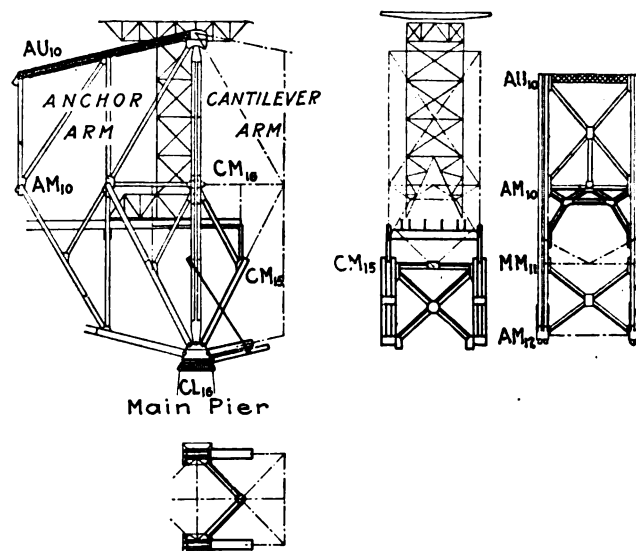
CANTILEVER MEMBERS PLACED BY TRAVELER OVER MAIN PIER
